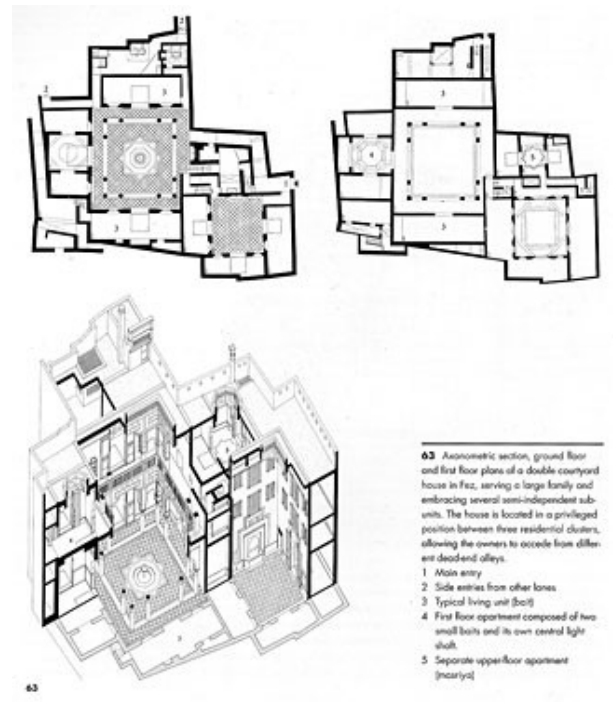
Floor plan and an axonometric section from one of the houses in Fes Town (Approximate Yard). Source: www.brynmawr.edu
